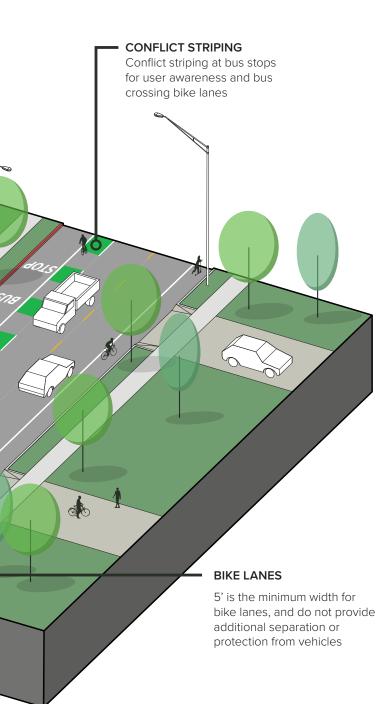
Concept F: Bike Lanes, Remove Parking on One Side for Benton Street 38-Foot-Wide Typical Section
